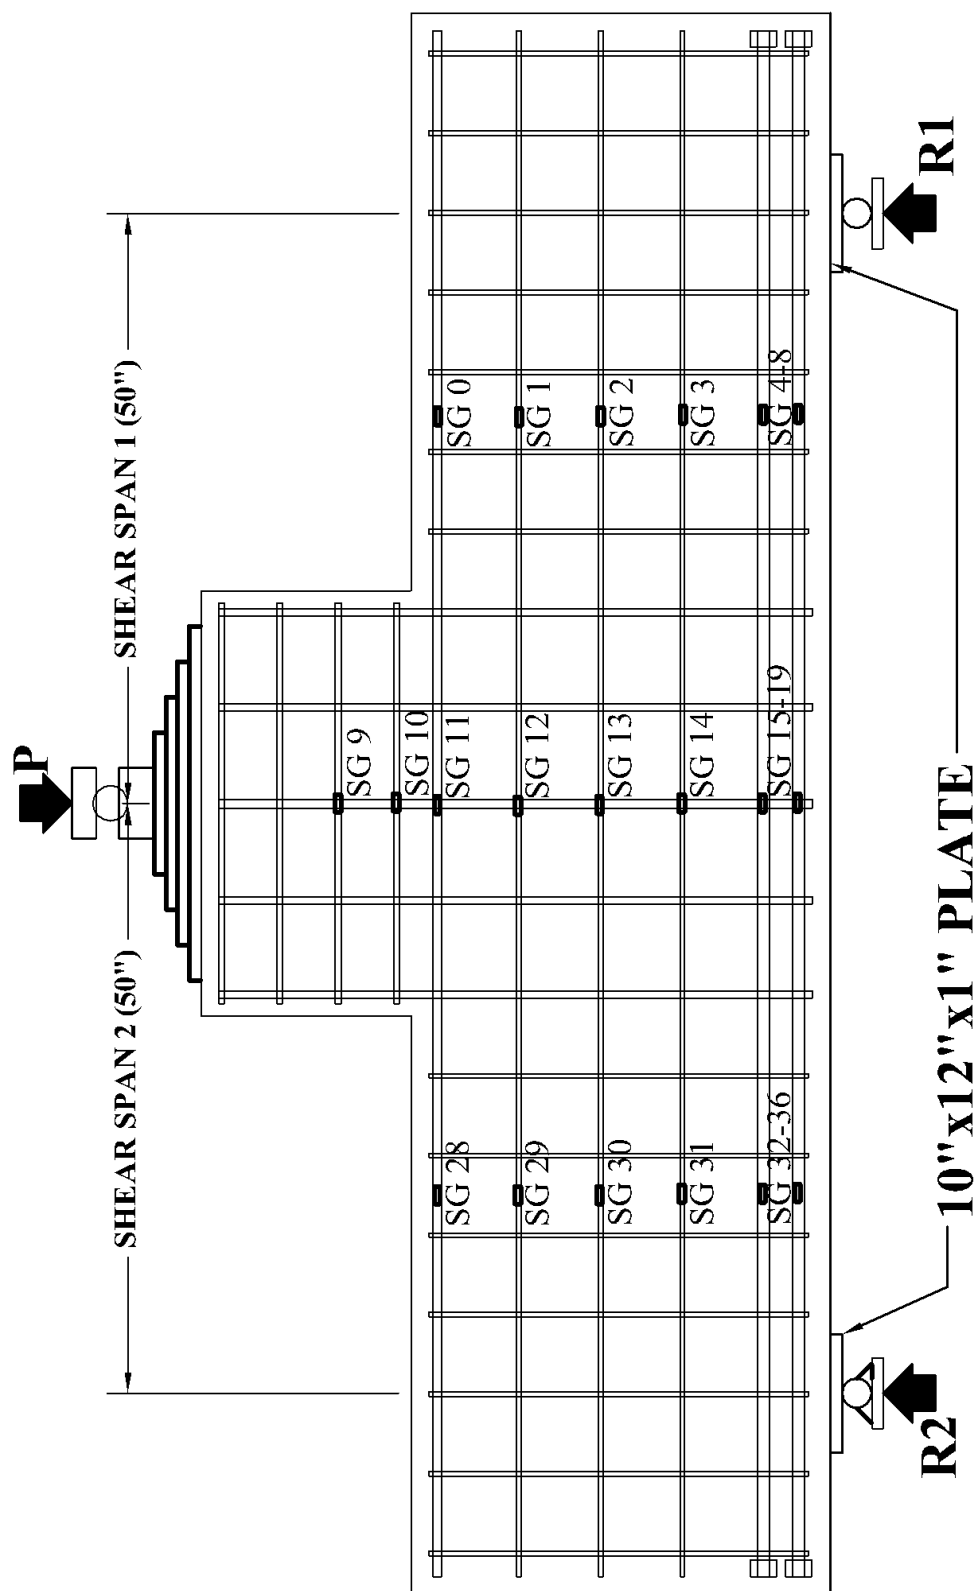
Location of strain gauges on reinforcement in specimens with internal shear reinforcement
